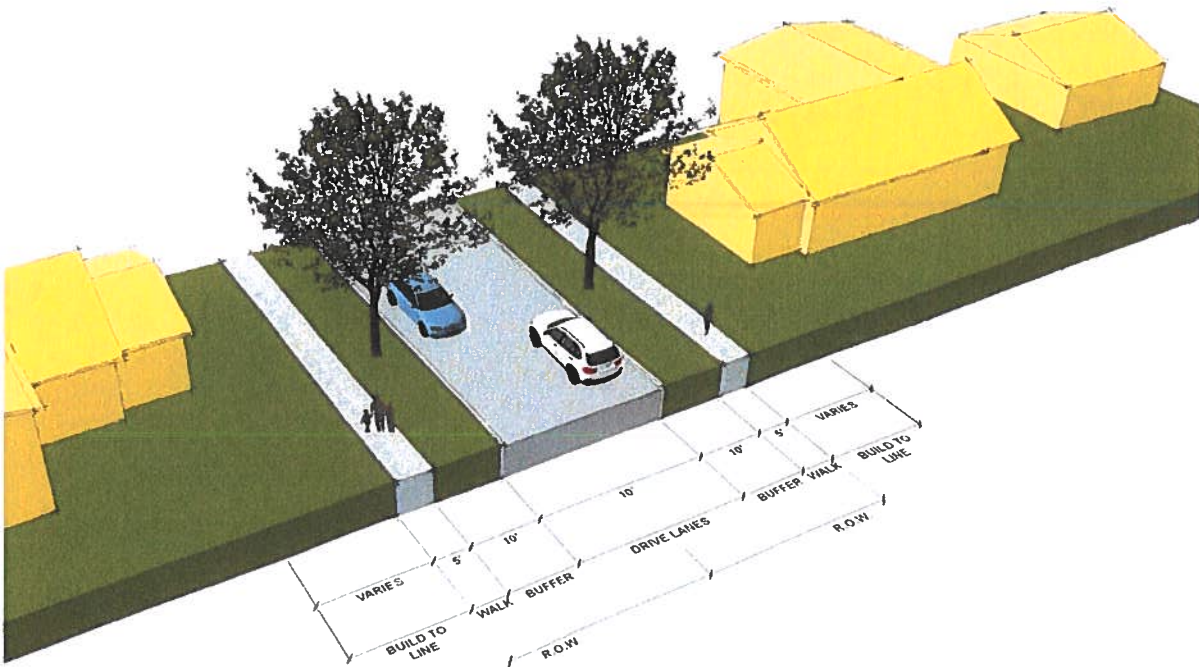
E. Neighborhood Street Adjacent to Blue Creek Greenway Corridor.
